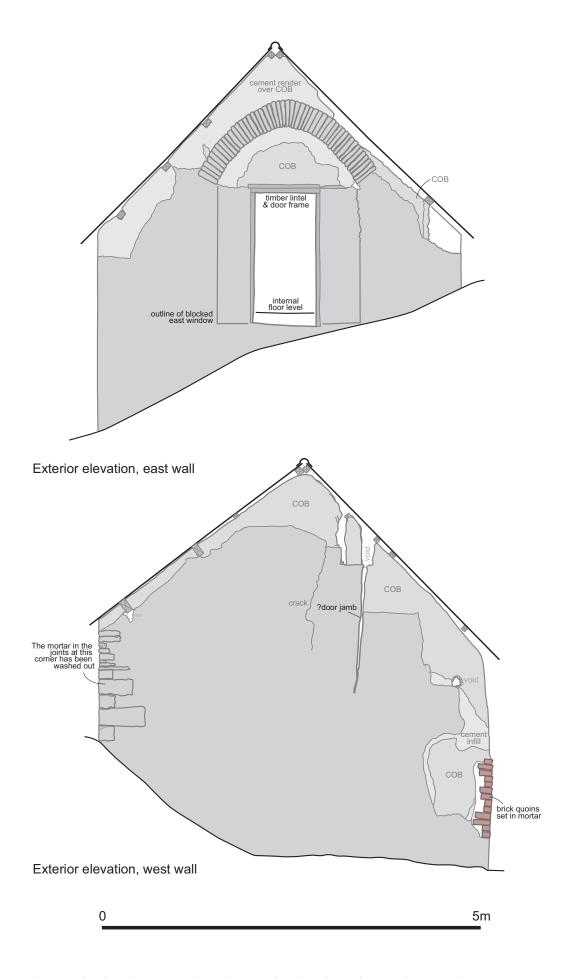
The chapel at Lower Alsworthy, exterior elevations of east and west walls (scale 1:50 @A4).
